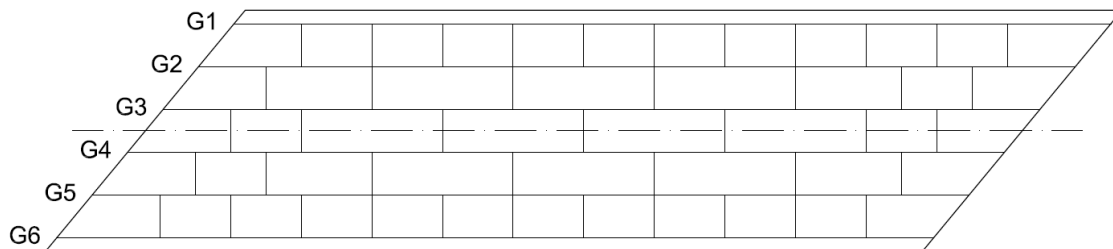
Modified staggered cross-frame arrangement of Bridge 18 satisfying AASHTO LRFD C6.7.4.2 recommendations.
